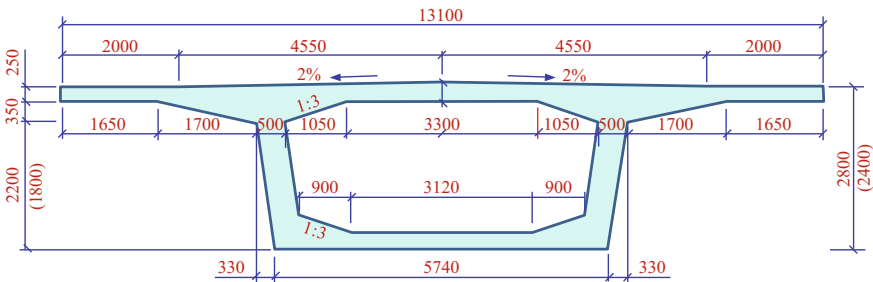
Cross section of the 32 m (24 m) simply-supported PC box-beam (unit: mm)
